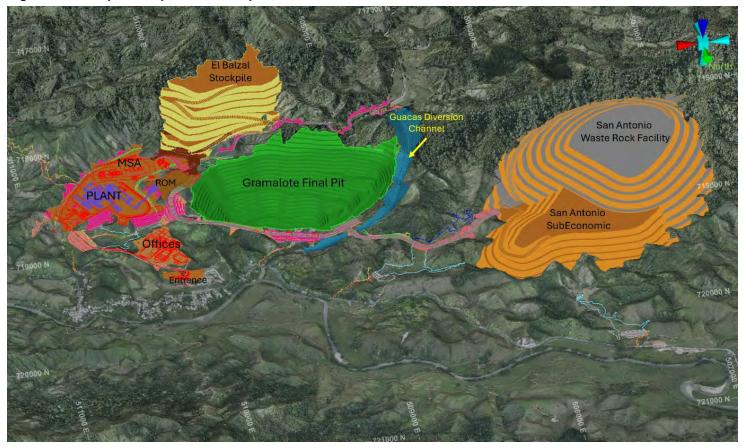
Proposed Open Pit, Stockpile, and WRSF Location Plan
